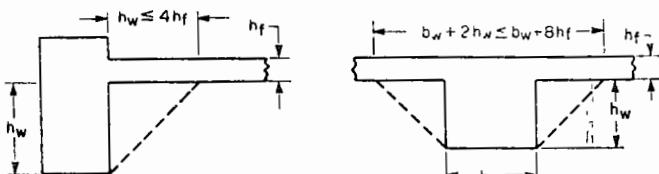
Examples of the portion of slab to be included with the beam under Section 13.1.5
